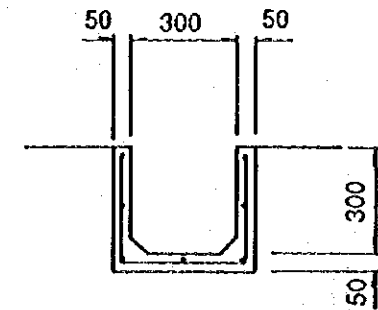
DETAILS OF SIDE DITCHES AND DRAINAGE FOR IRRIGATION Scale: 1/20
